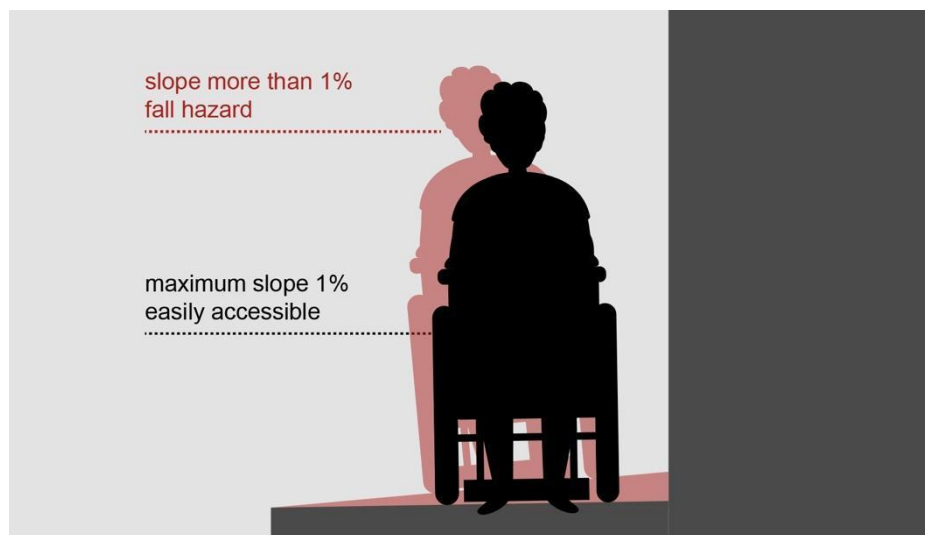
Section diagram illustrating the recommended maximum transverse slope of 1% (Authors' work)
